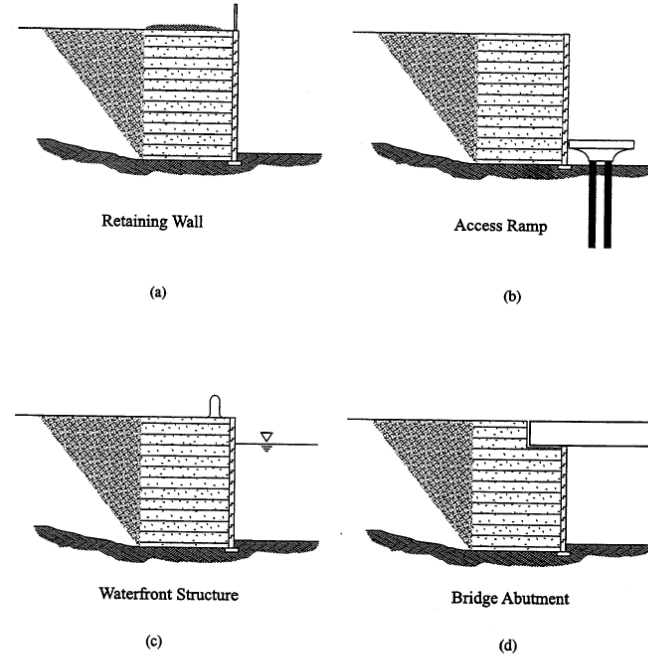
Representative MSE wall applications (a) retaining wall; (b) access ramp; (c) waterfront structure; and (d) bridge abutment.
